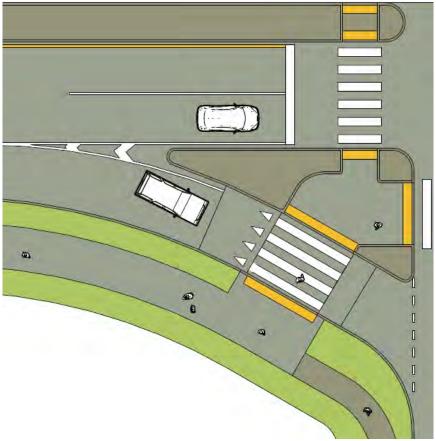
Plan View of Raised Crosswalk at Right Turn Lane Source: Toole Design Group, 2017.
